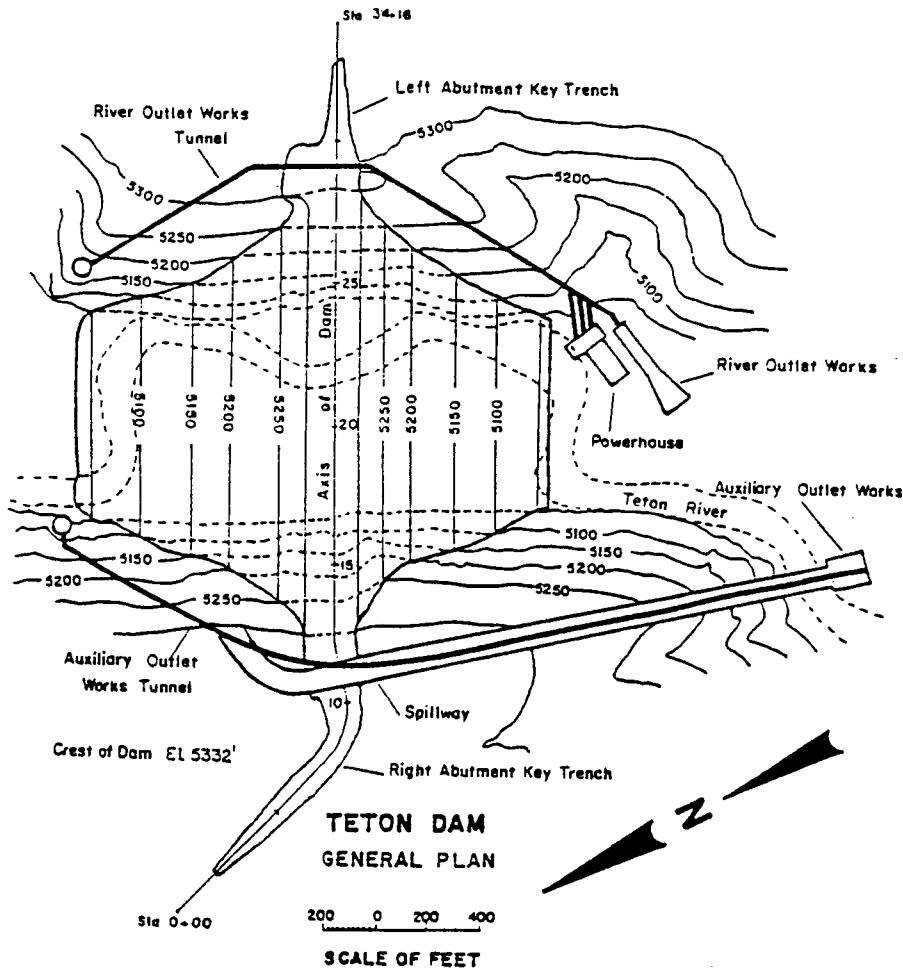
General plan of the Teton Dam, based on the original design drawings of the US. Bureau of Reclamation, with dimensions in feet (2 ft = 0.305m). The failure initially occurred in the right abutment, where the dam meets the canyon wall. On 5 June 1976 the water level reached 5309 ft, more or less at spillway level - then the failure happened.
